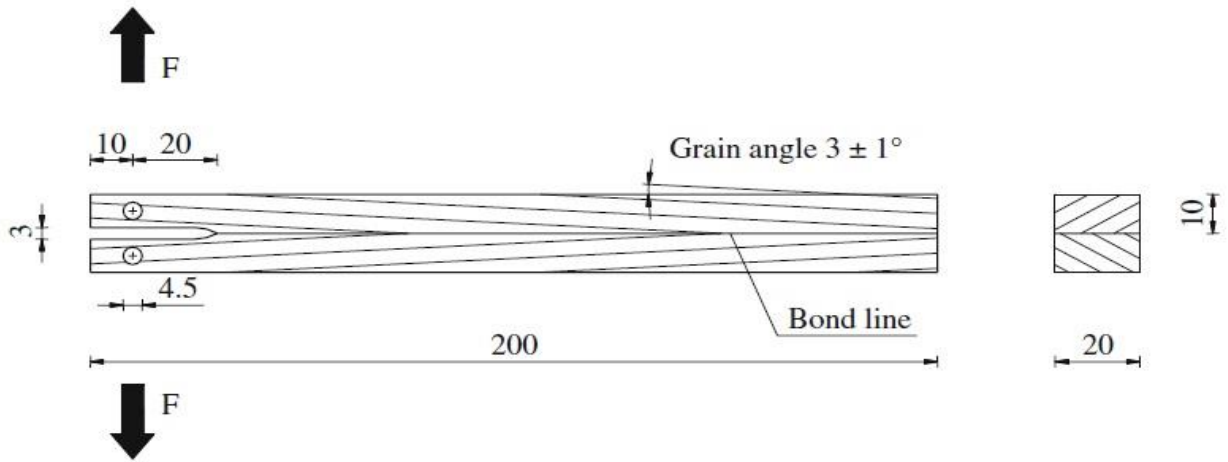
Geometry of flat double cantilever beam (DCB) specimens for fracture energy tests. [110]
